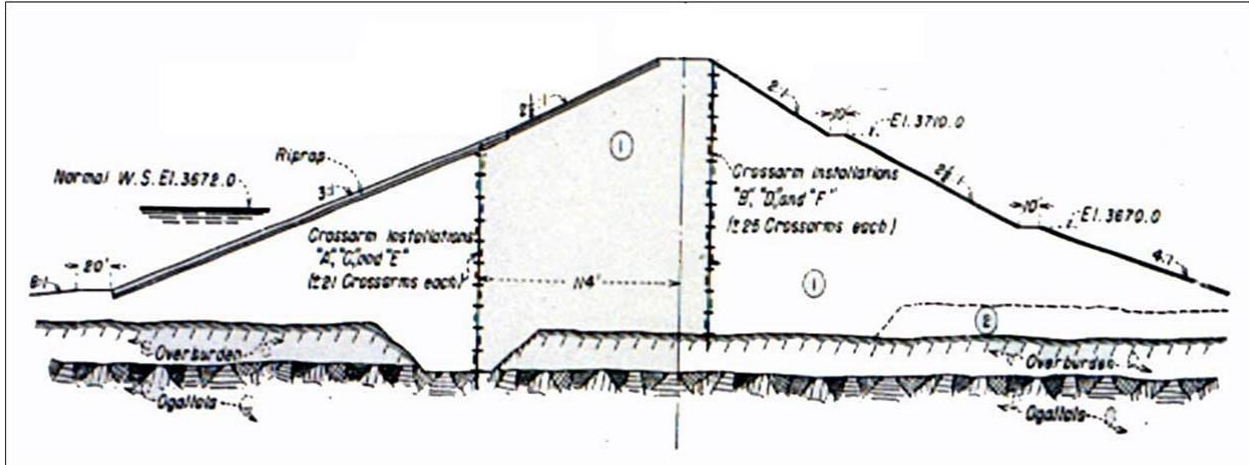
Drawing of two IVM installations at a cross section through an embankment dam. The bottom crossarm of the left IVM installation is on bedrock, while the bottom crossarm of the right IVM installation is on foundation soil.
